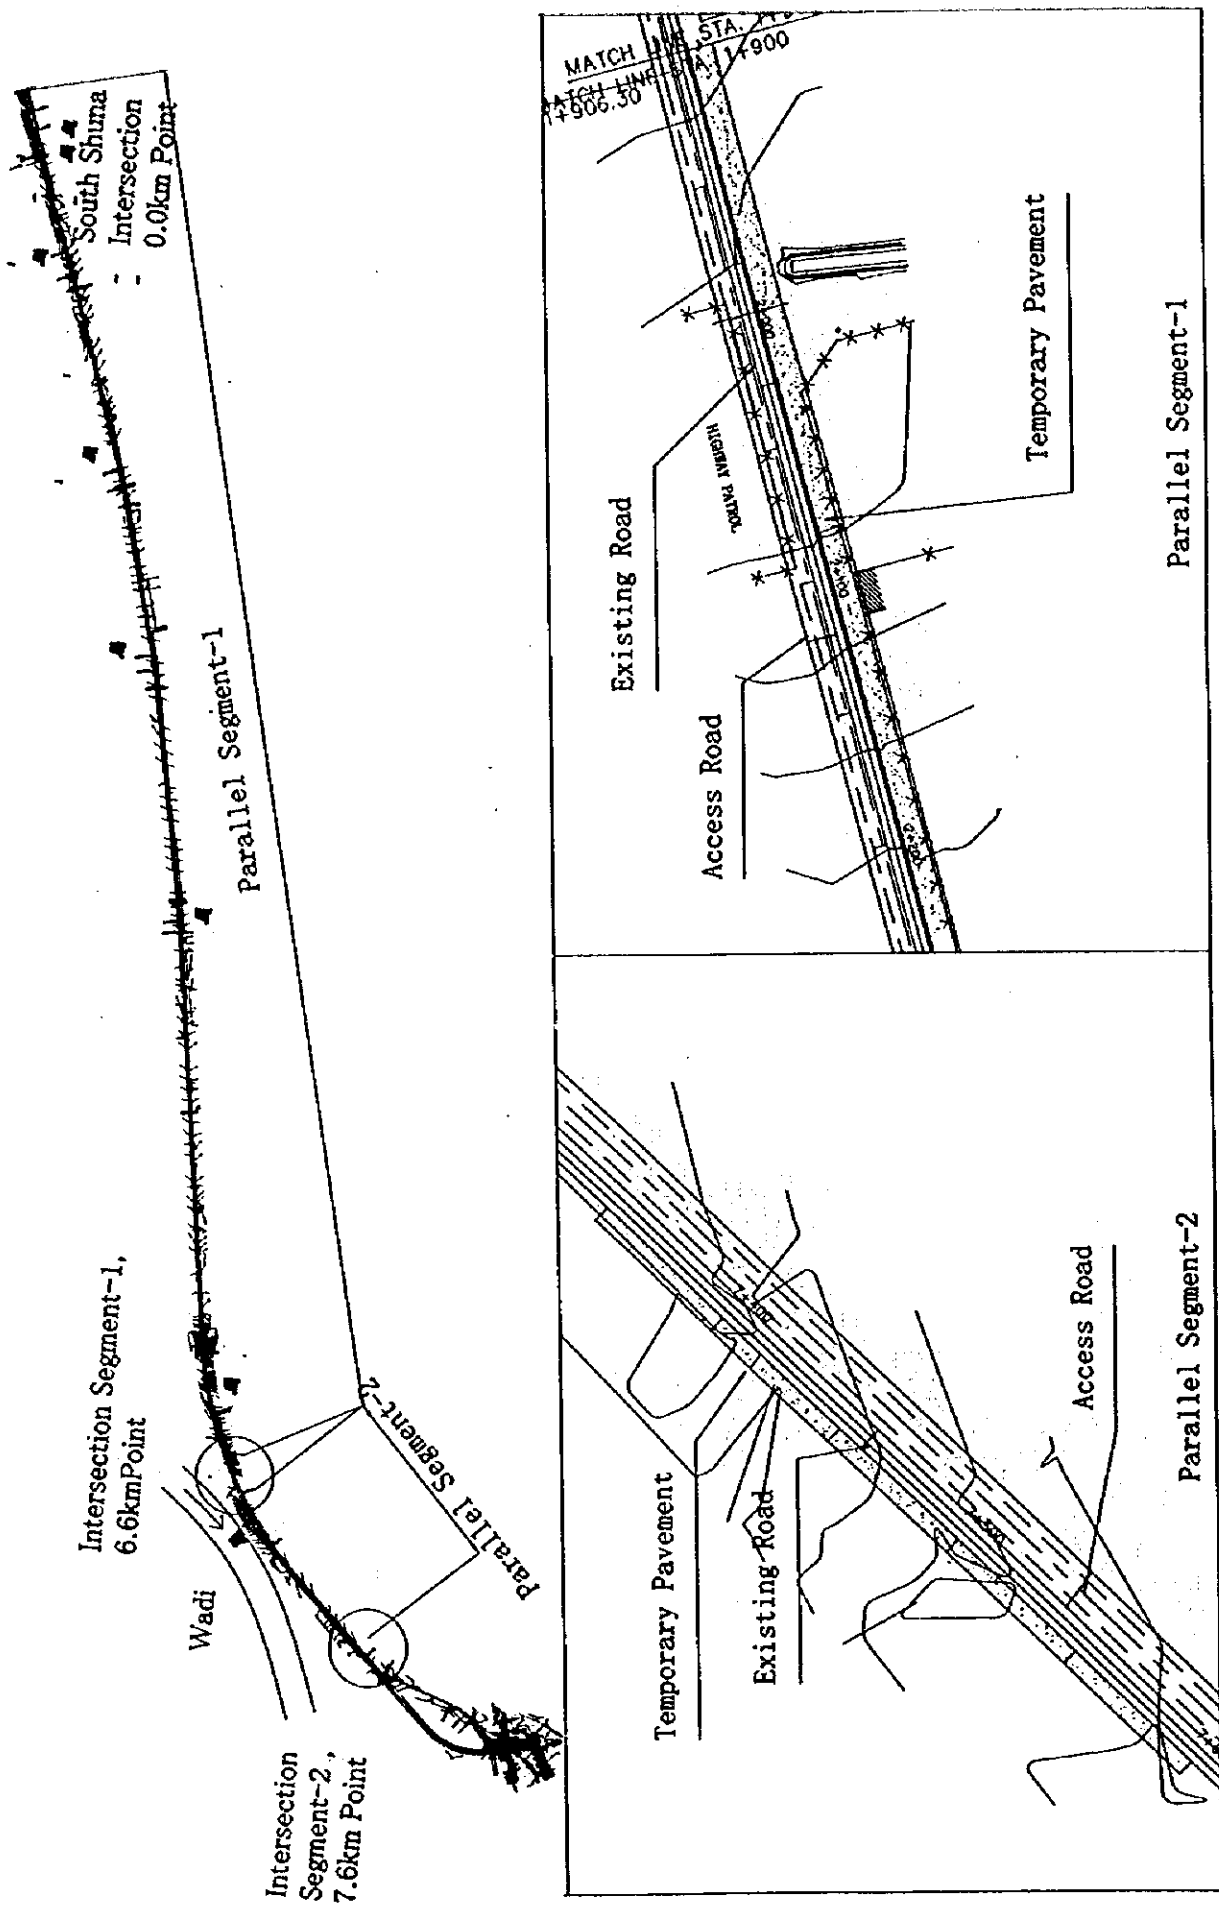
Conceptual Plan of Access Road and Its Parallel Segments
